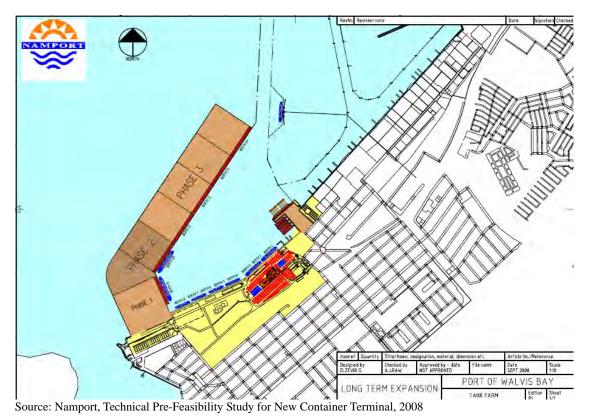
Proposed Alternative Expansion Plan 1 (2008)
